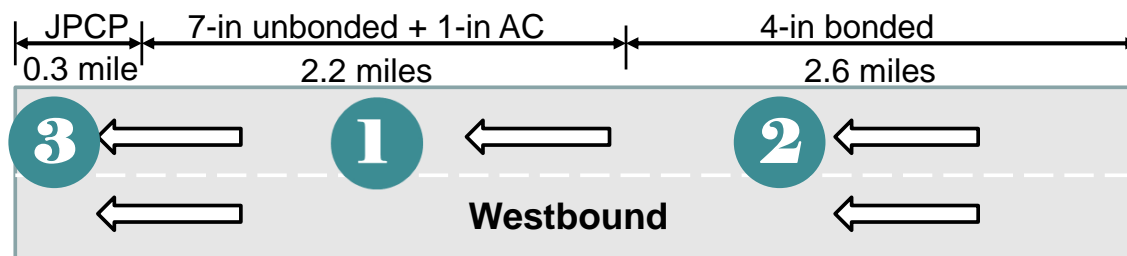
Construction Sequence (Sprinkel et al., 2014). AC = asphalt concrete; JPCP = jointed plain concrete pavement.
